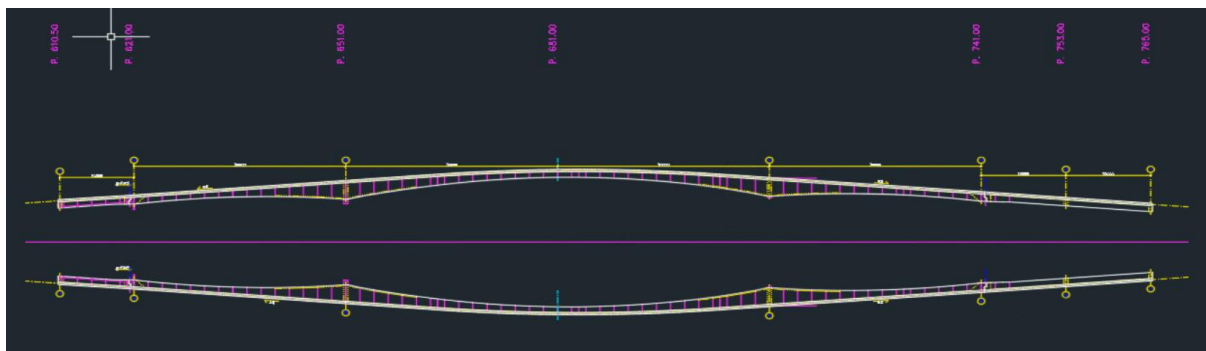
Herøysund Bridge layout drawing [12, 19]
